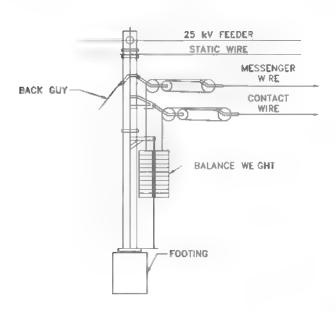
TYPICAL BALANCE WEIGHT ASSEMBLY AT DEAD ENDS
